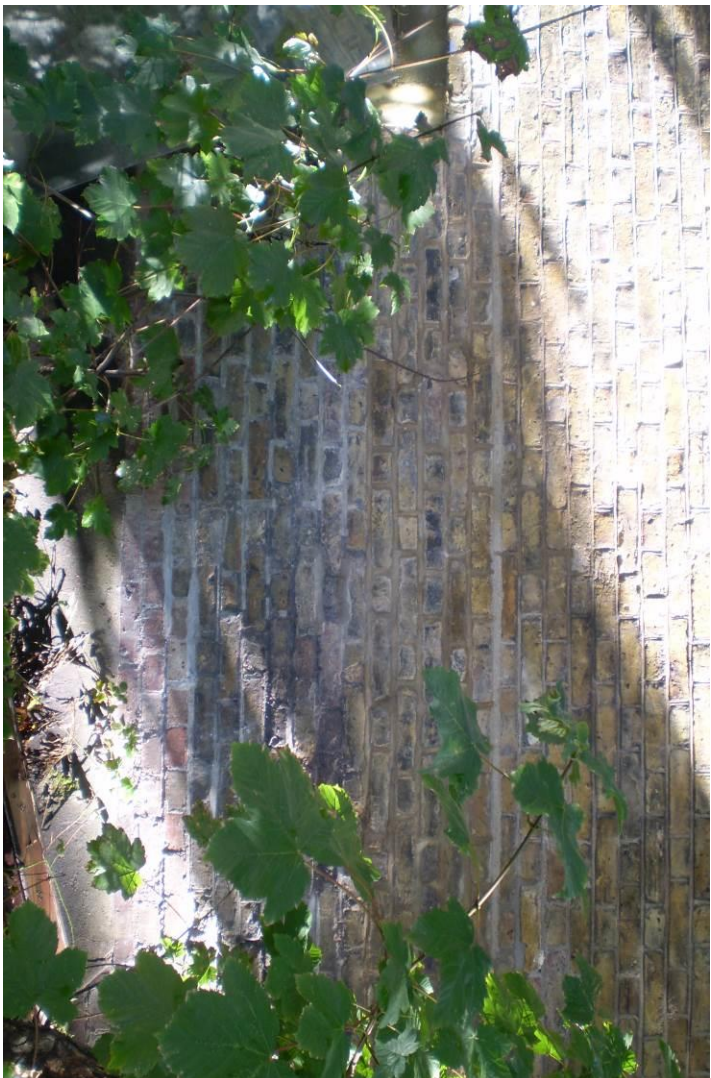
Further repaint/crack repairs to rear elevation to adjoining property
